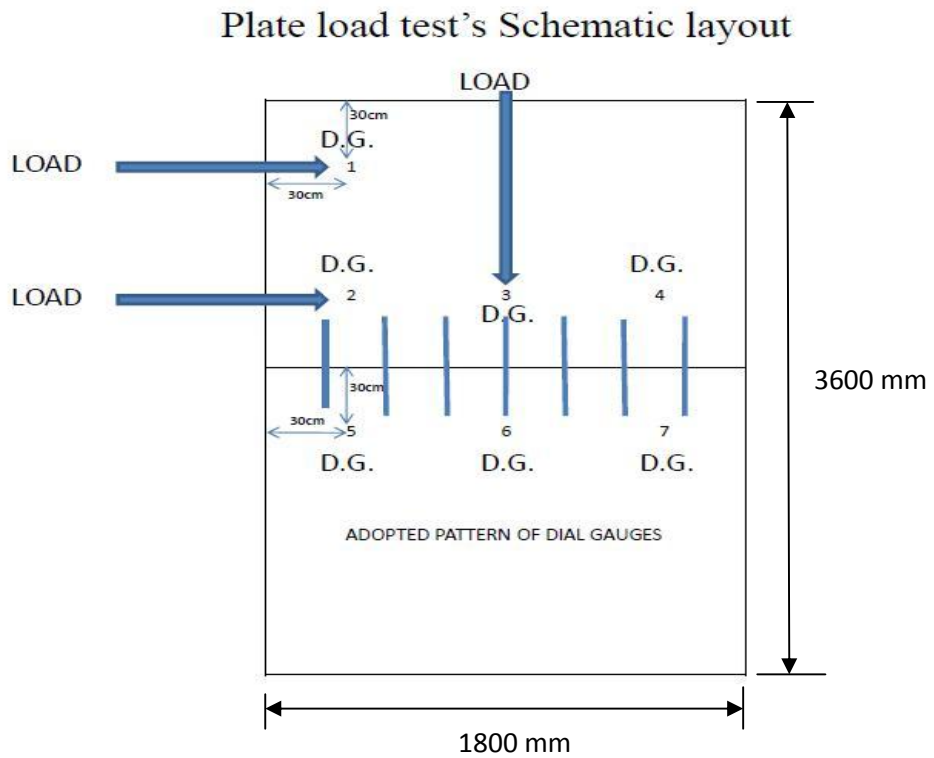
Schematic layout of Plate load test conducted in the laboratory
